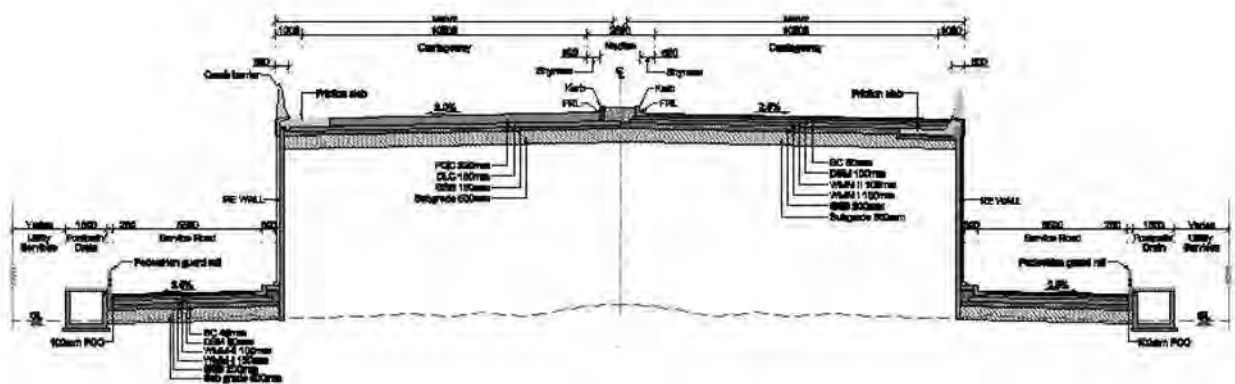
TCS 10.1- Approach Of Elevated Structures
